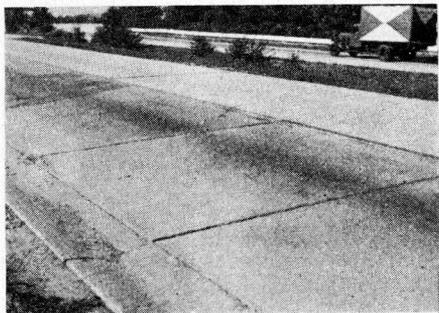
Slab settlements on pavement constructed in 1937 and located on plastic Wisconsin till.
